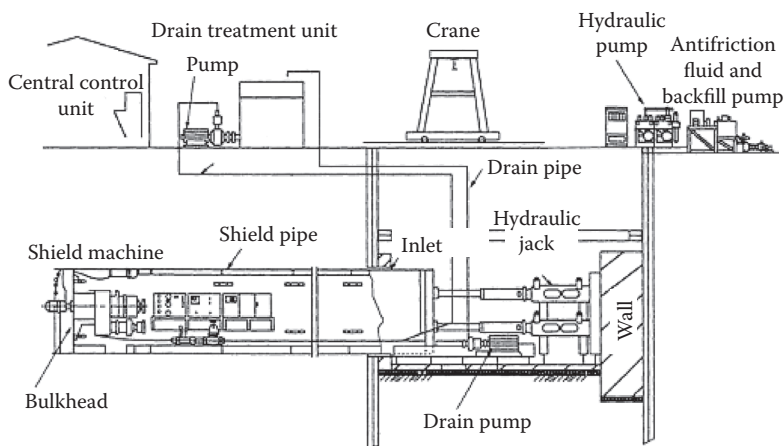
Simple pipe-jacking construction system for small-diameter pipes. (From Japan Society of Civil Engineers, *New Frame of Civil Engineering 96—Pipeline*, Gihodo Publishing, Tokyo, Japan, 1991, pp. 132.)
